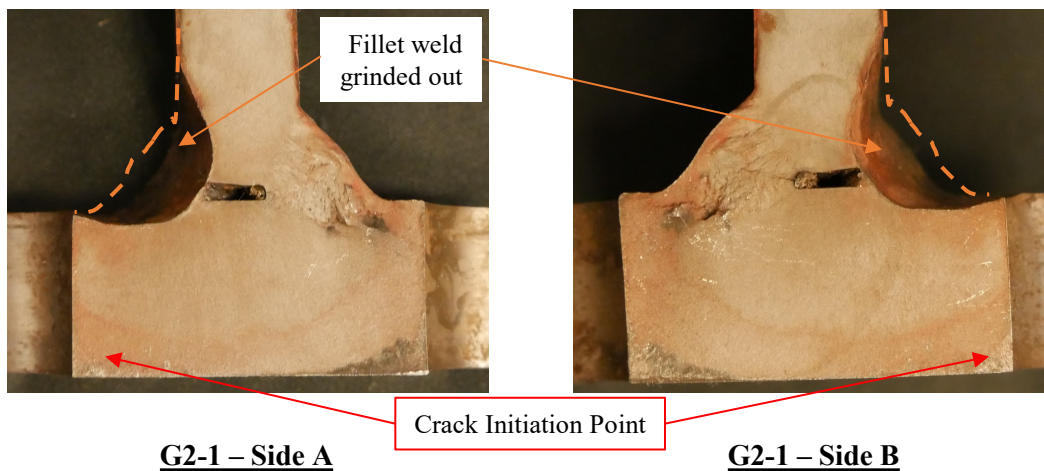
Illustration. Overview showing the different fatigue cracks for Girder 2 – Flange 1.
